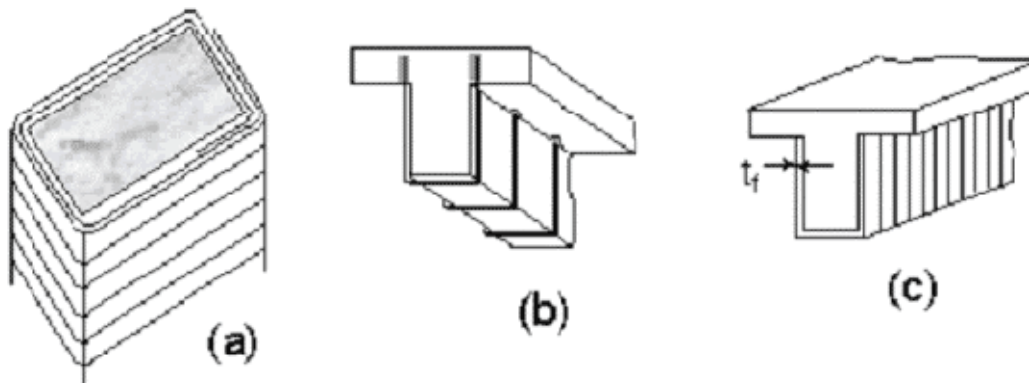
Examples of shear strengthening with: (a) closed (properly anchored) jackets; (b) discrete strips anchored in the compression zone; and (c) open jackets.
